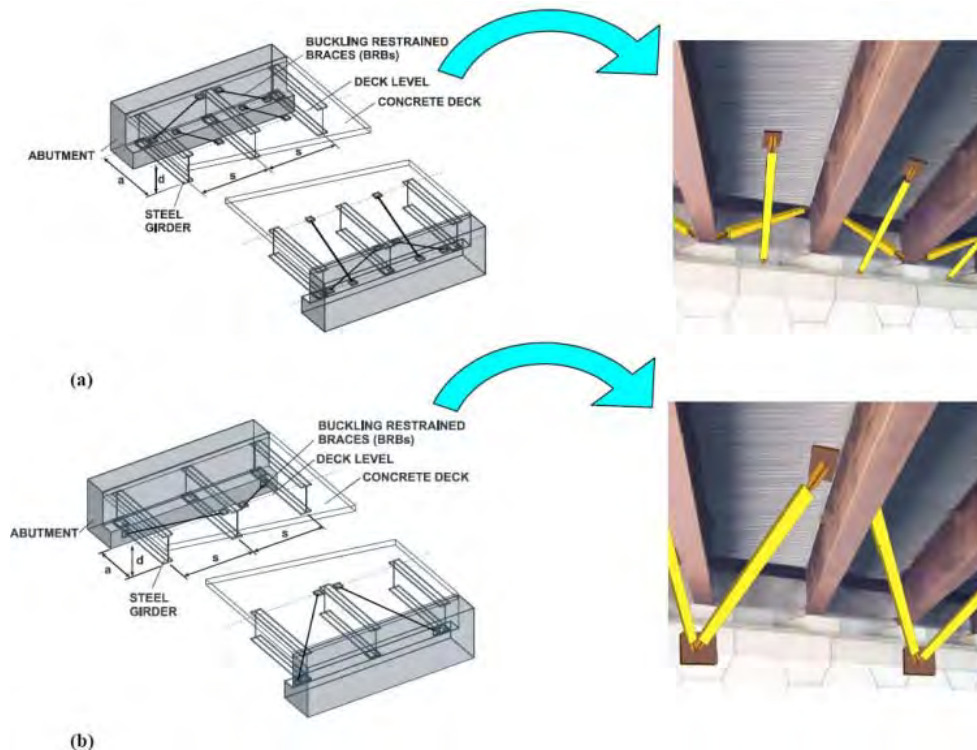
Proposed Schemes for Bridge Ductile End Diaphragms: (a) EDS-1; (b) EDS-2
